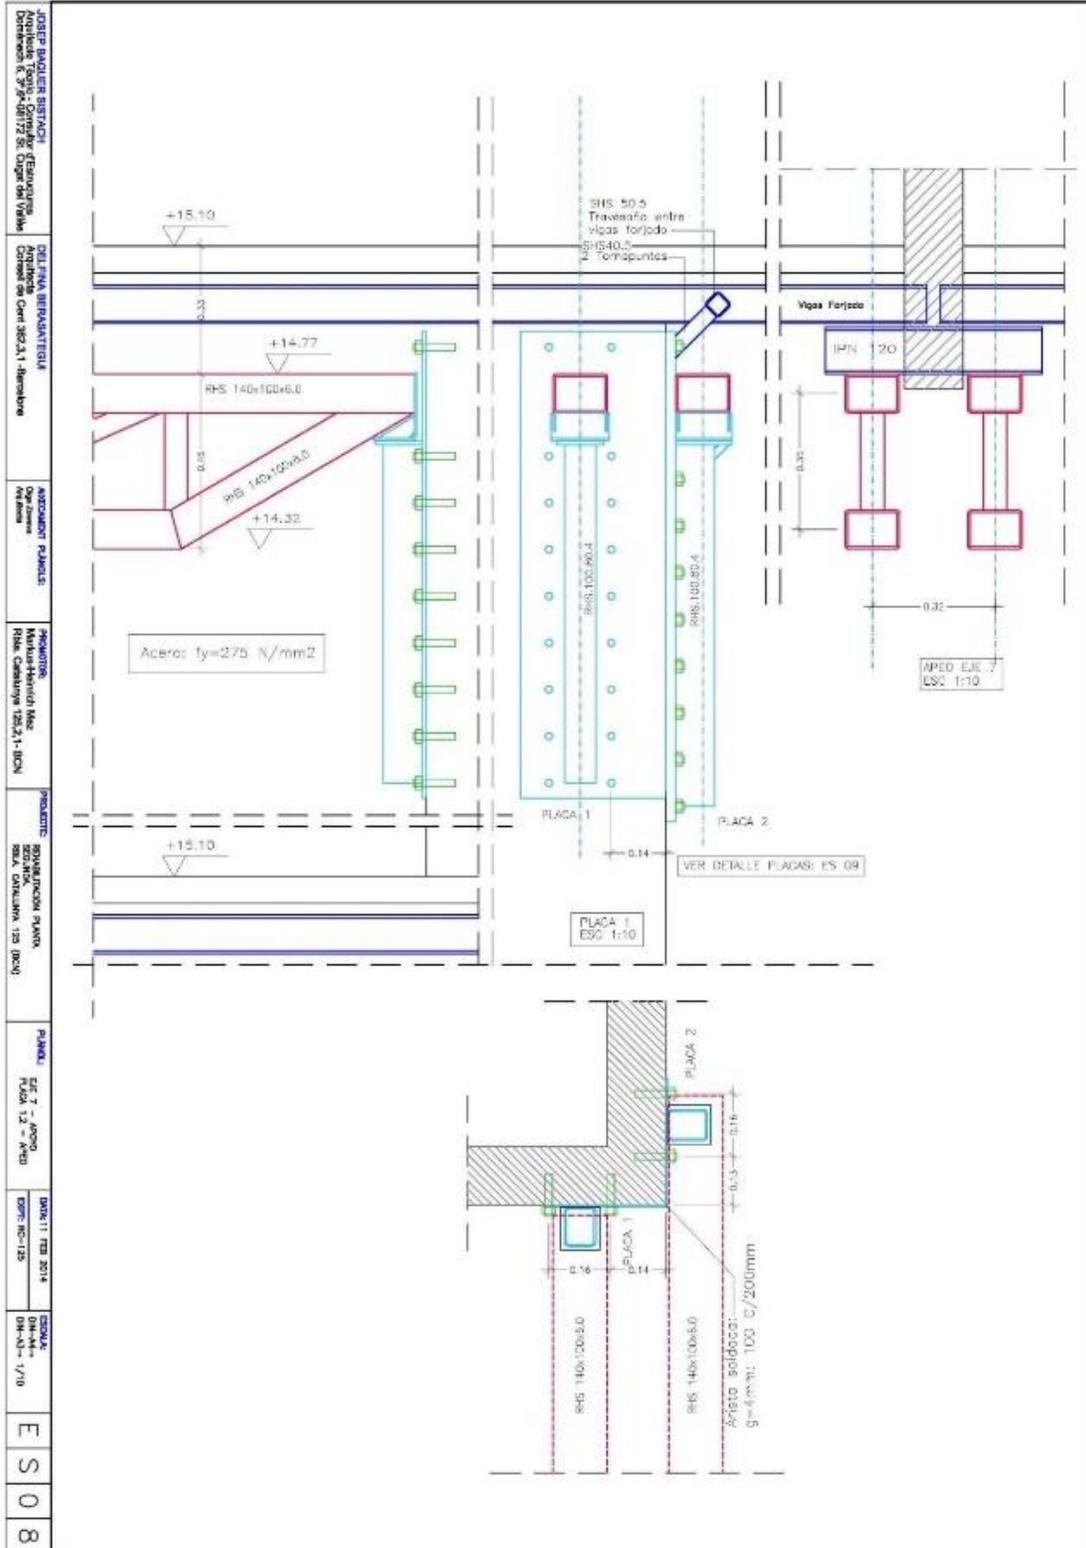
Technical details showing how to anchor the structural elements to the masonry wall. ©Josep Baquer
